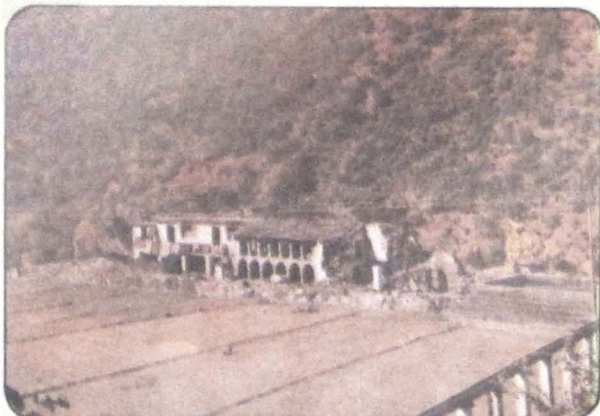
Partial collapse of an old house located on Yamuna terrace. Small water channel supported on high pillars has escaped damage.
